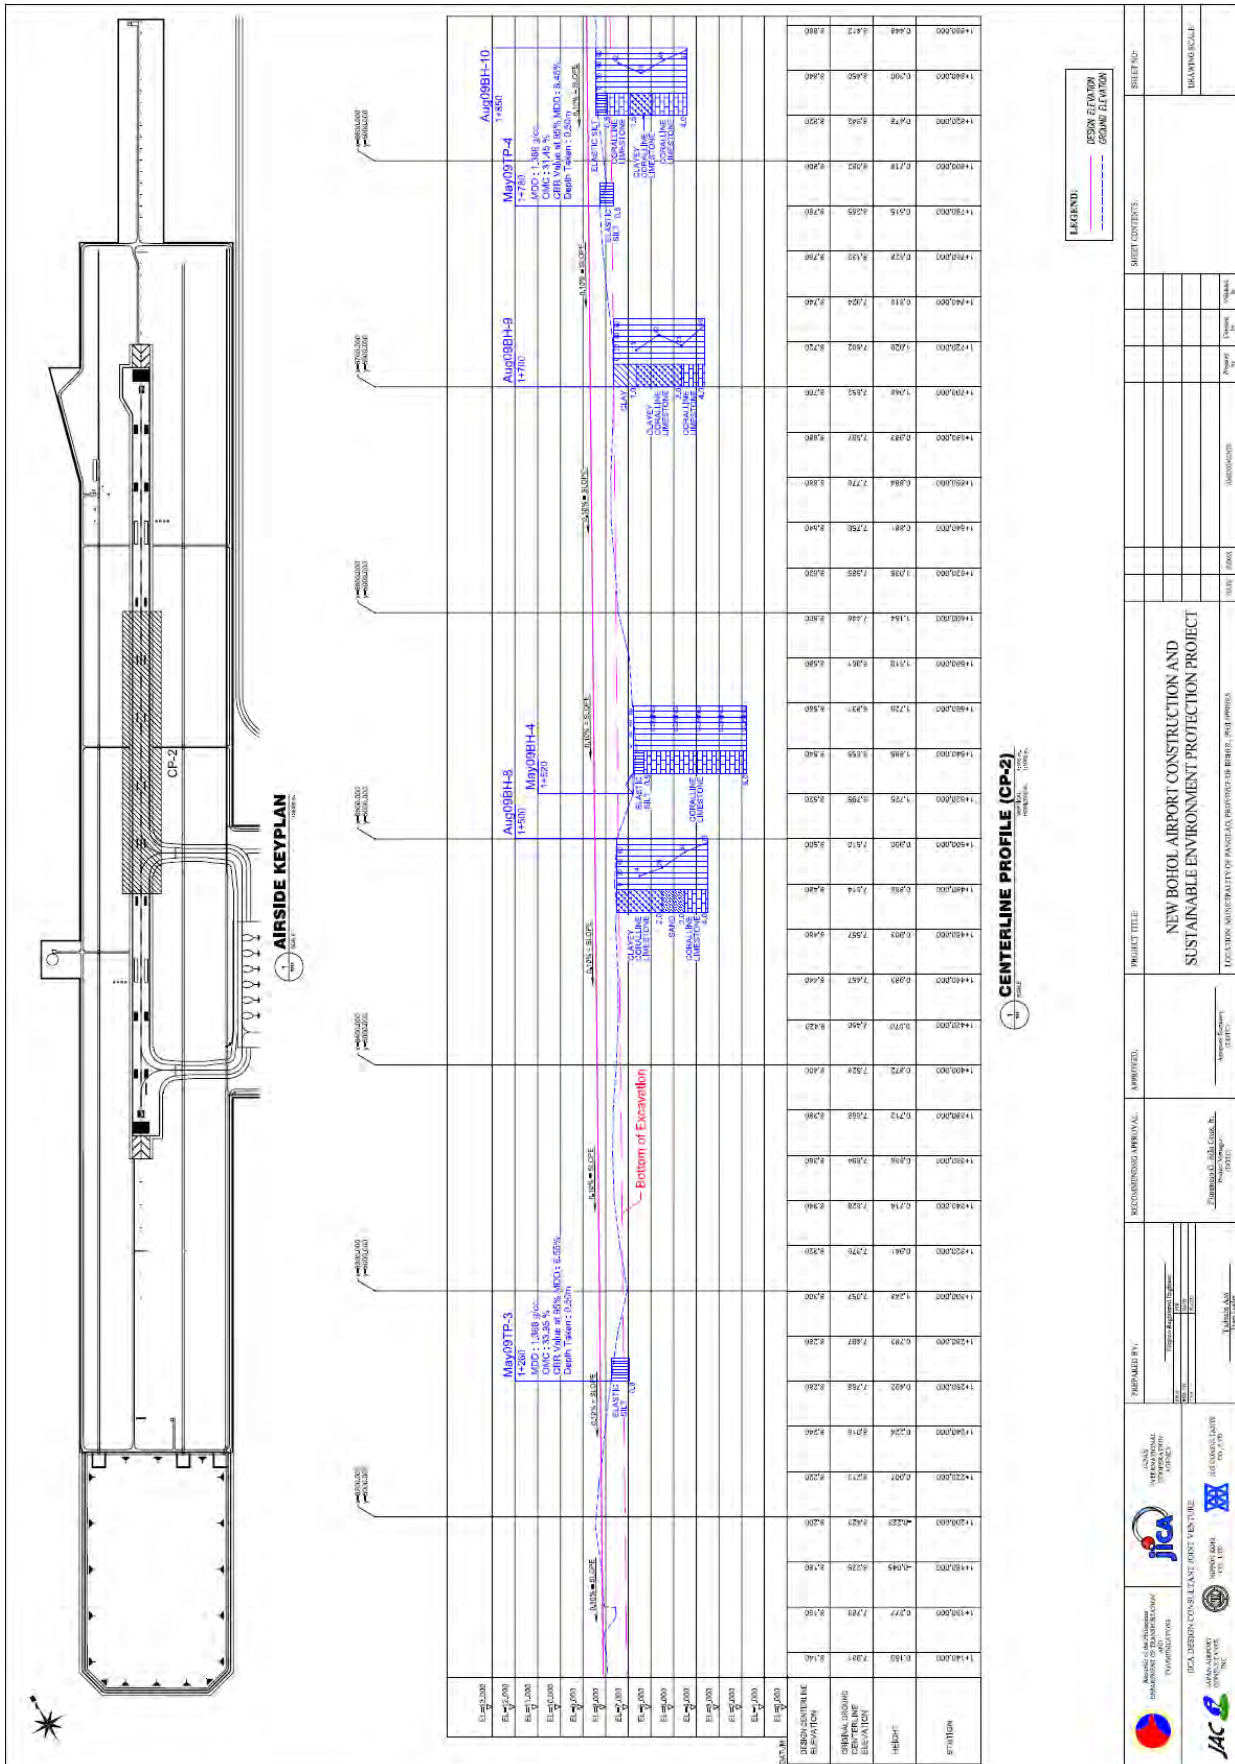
(2) Runway Centerline Profile with Borehole and Test Pit logs (sta. 1,140 m - 1,860 m)
